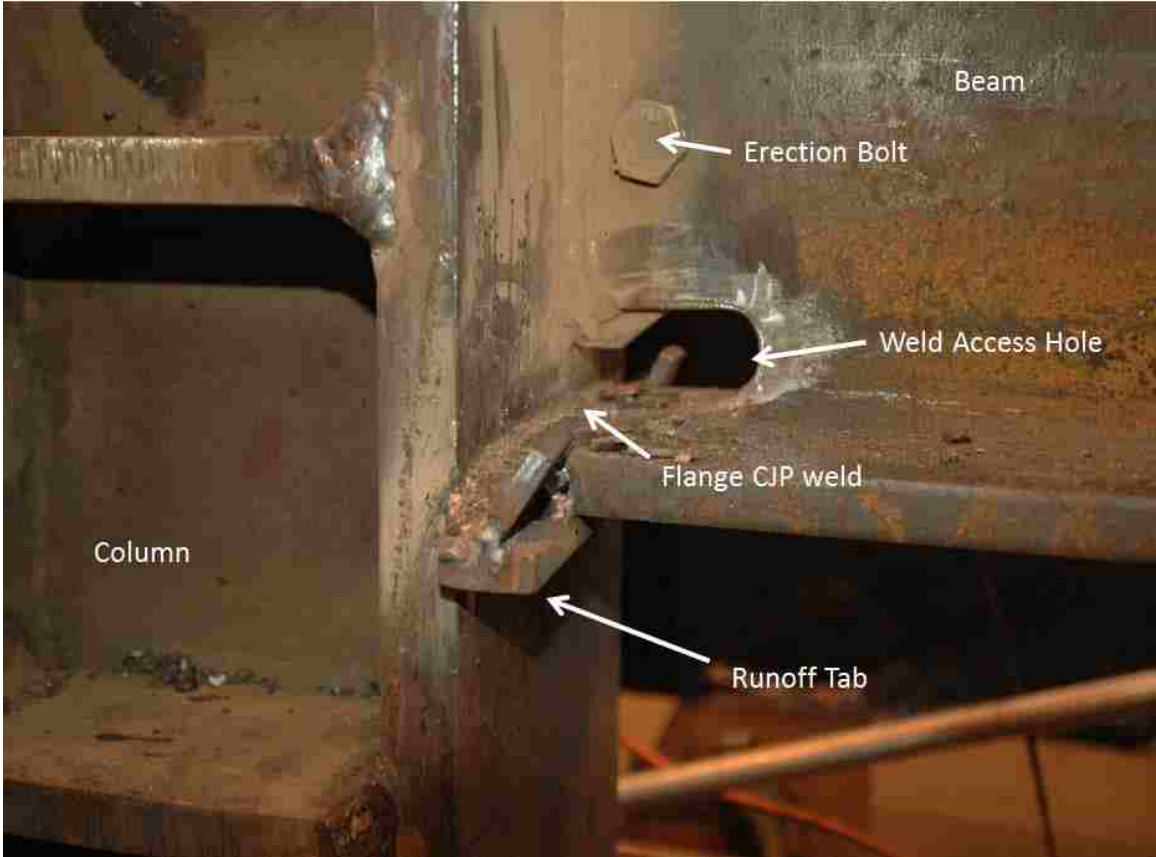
Ground Floor Bottom Flange with Run Off Tabs, Post Welding
